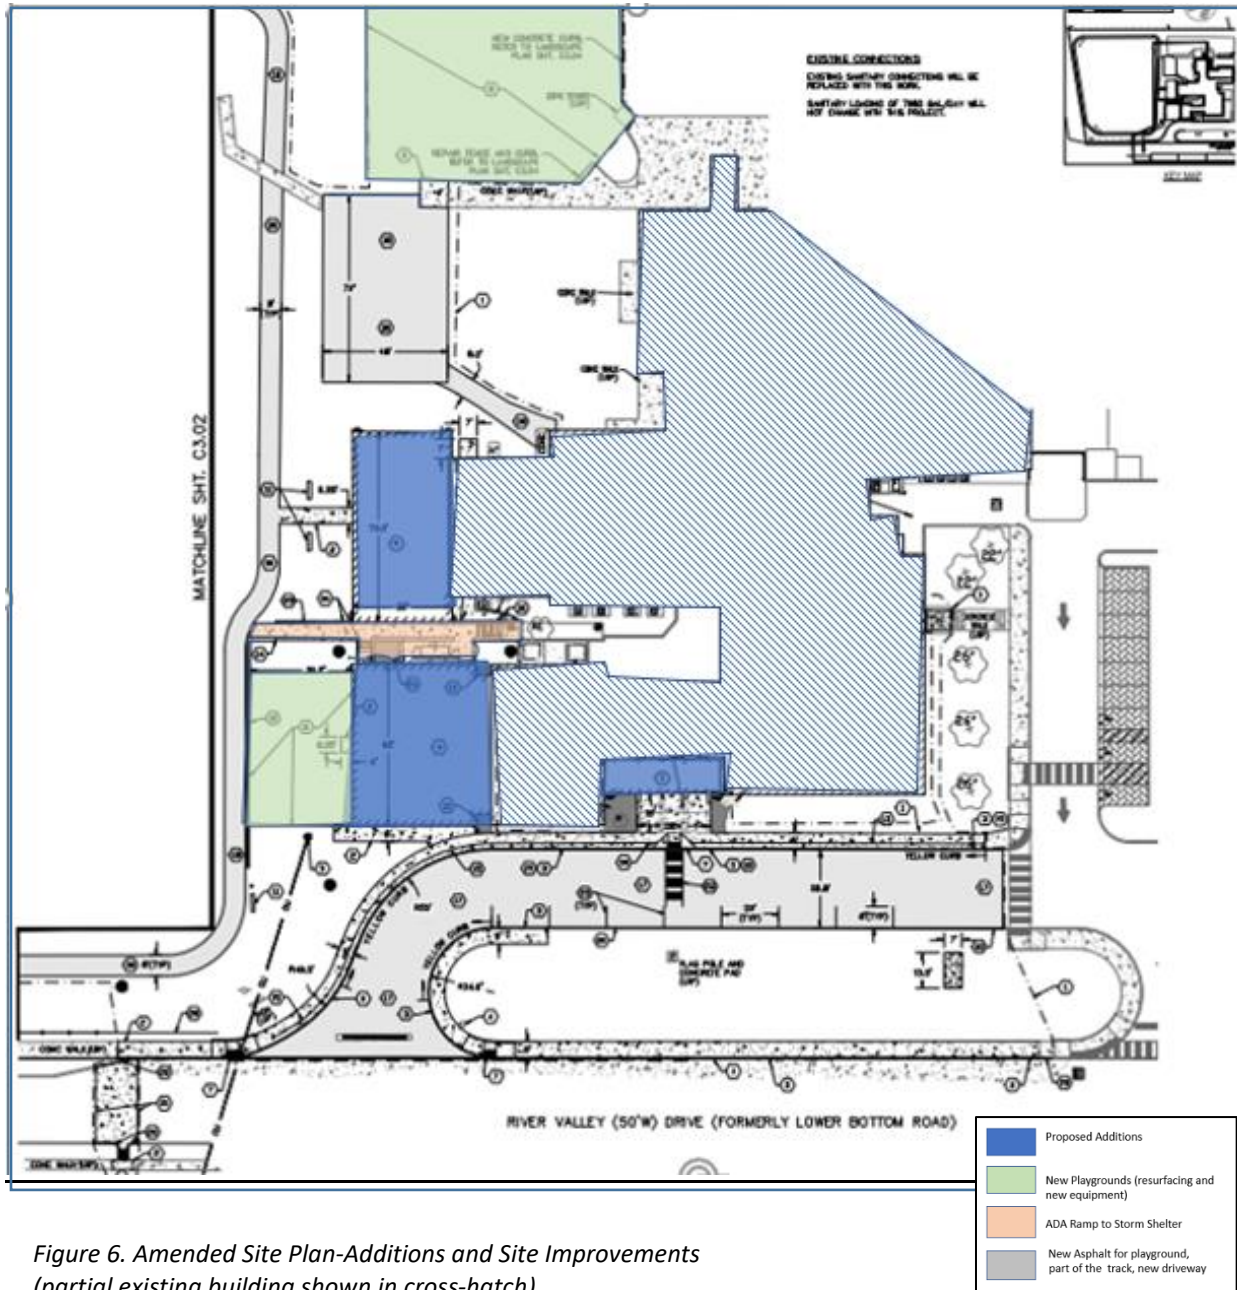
Amended Site Plan-Additions and Site Improvements (partial existing building shown in cross-hatch)
